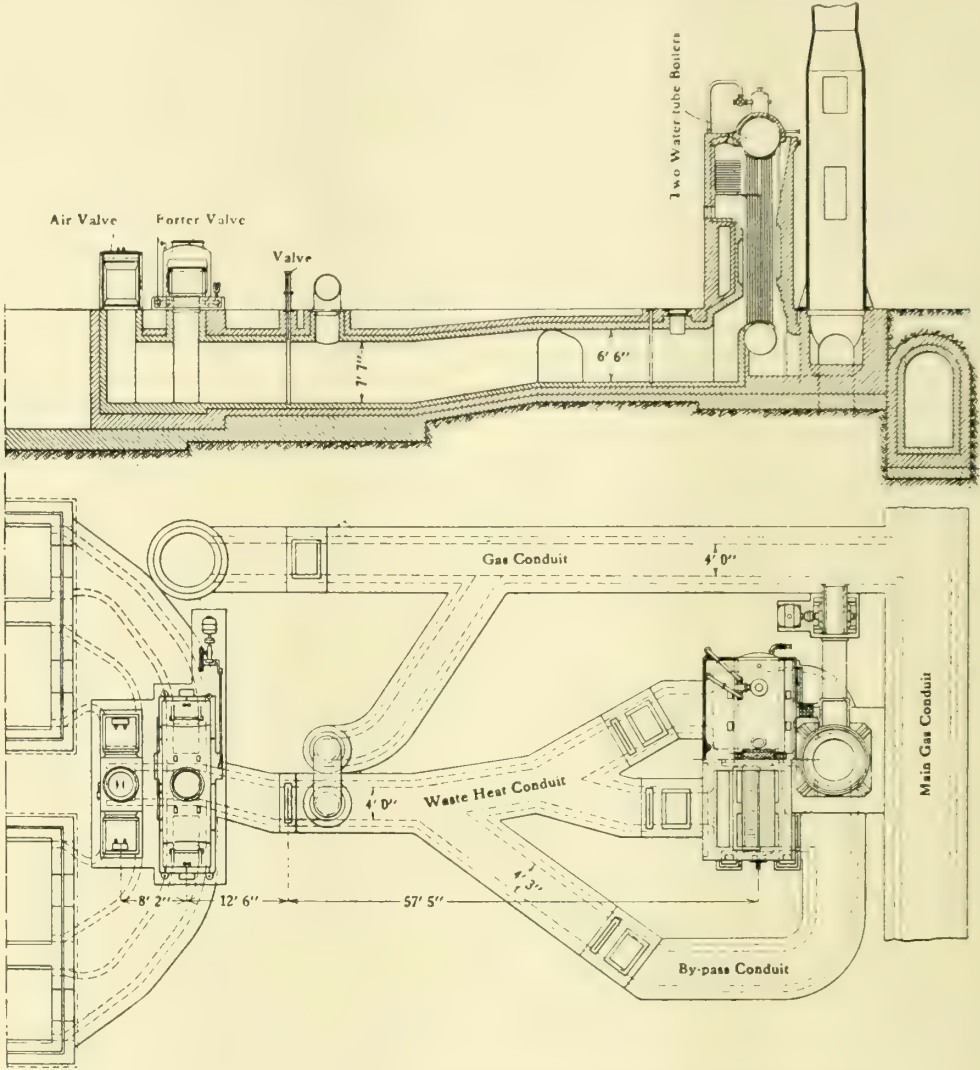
DETAILS OF WASTE HEAT ARRANGEMENTS. MAIN AND BY-PASS CONDUITS, &c.
